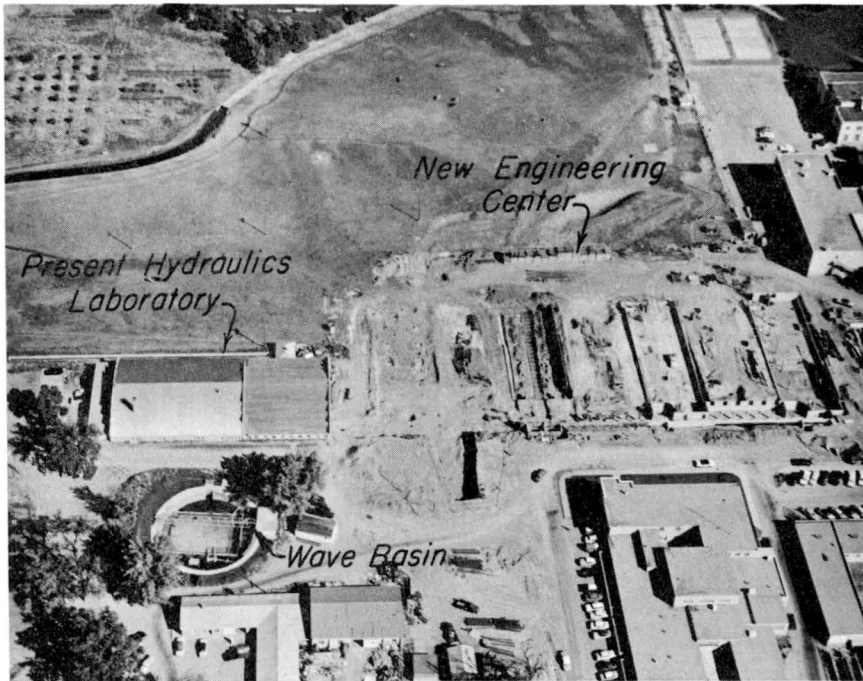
EXISTING BUILDINGS—HYDRAULICS LABORATORY
